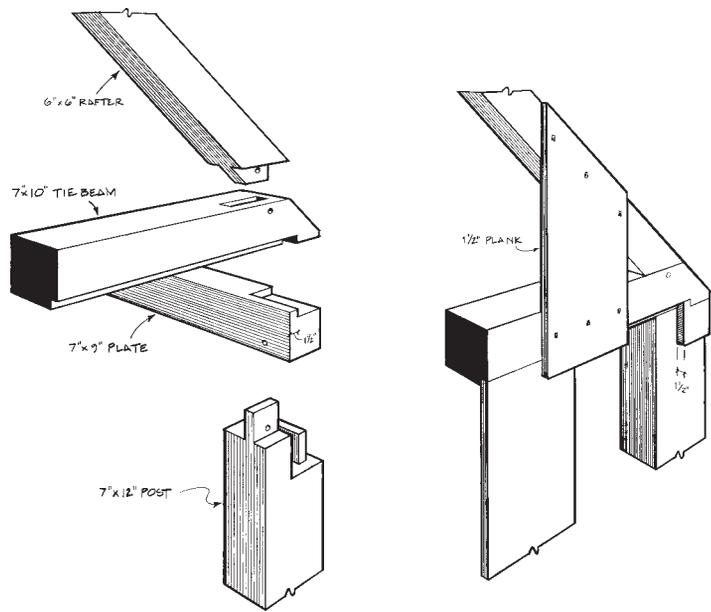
Full-width cog (1/2 in. square) found on the corner joints in a 1773 three-bay 28x36 barn in Adams, Massachusetts. This barn has dropped tie beams on interior bents. Note lapped end boarding.
